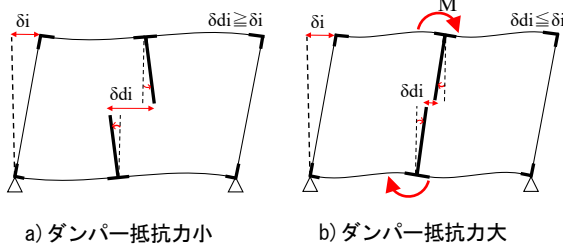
Deformation diagram of a frame with inter-column dampers installed
